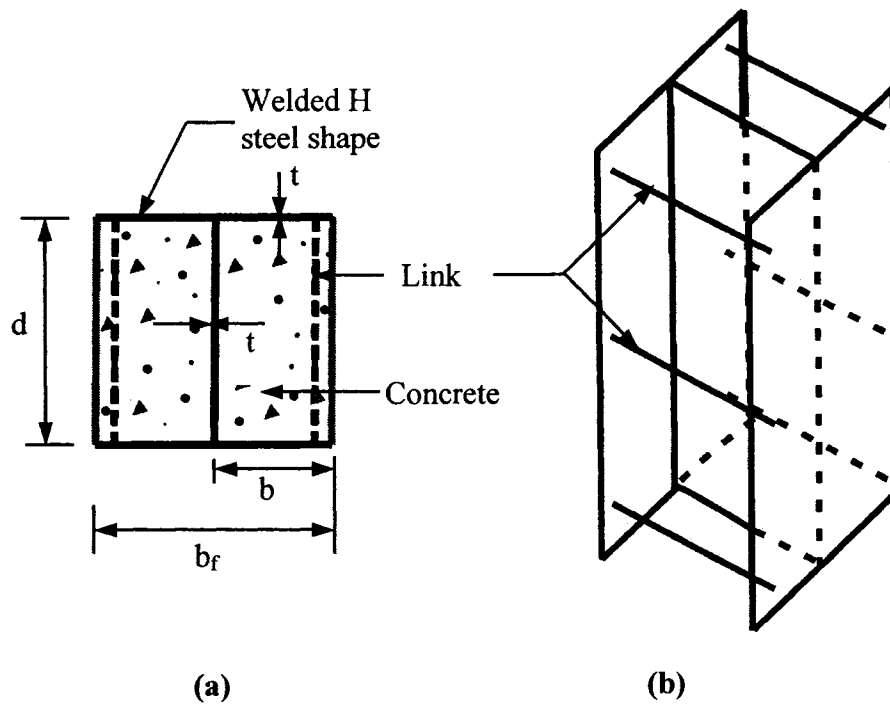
Partially Encased Composite Column with Thin-Walled Built-Up Steel Section, (a) Column Cross-Section and (b) 3D view of the Steel Configuration
